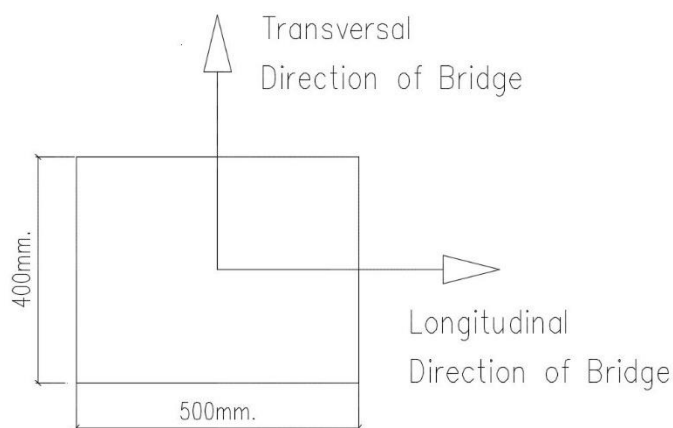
Elastomeric Expansion Bearing used in EBC10-REF Case (Top View)
